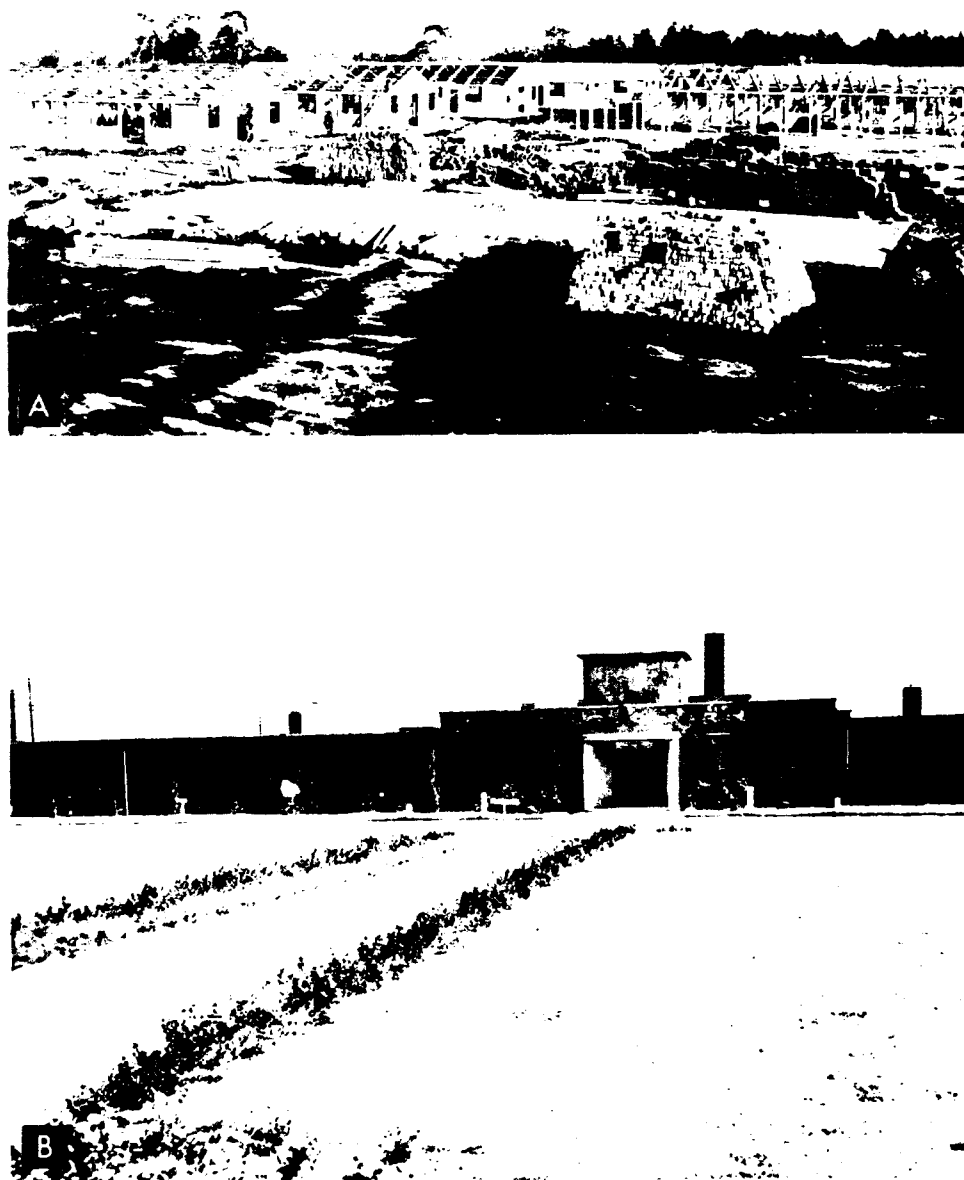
Typical examples of hospital construction in United Kingdom for U.S. Army. A. New construction underway at East Moors, Rigwood, Hants., England, 13 January 1943. B. Typical hospital headquarters building of permanent brick construction erected for U.S. Army.
